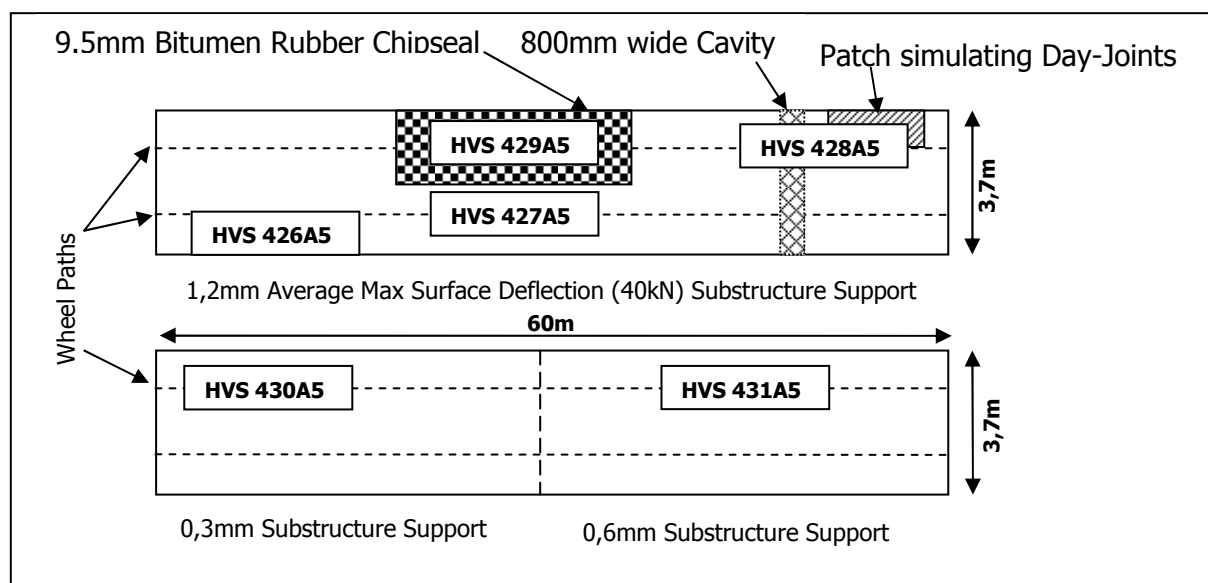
HVS Test Layout on Experimental Sections – Phase 1
